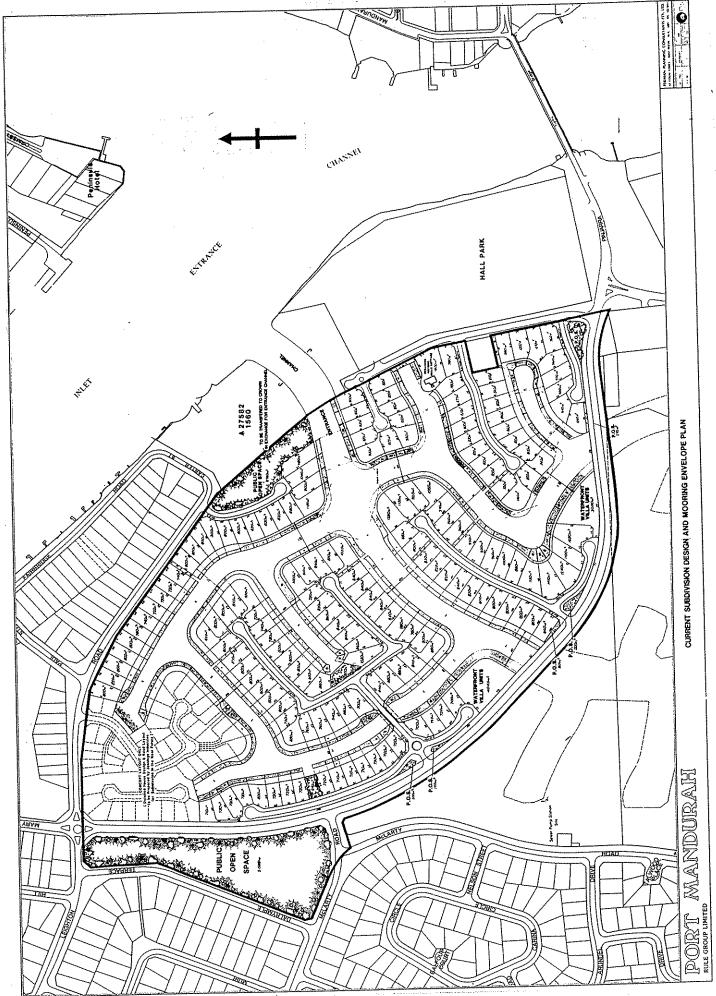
Area and design of Proposed Port Mandurah Waterways Development, as amended in March 1989 (Source: Esplanade (Mandurah) Pty Ltd: 1989)
